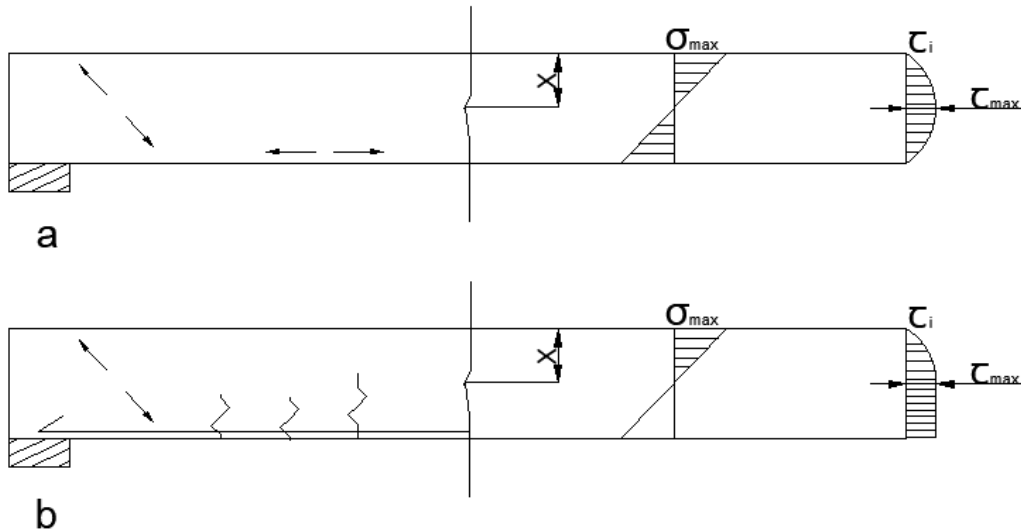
The normal and shear stresses in reinforced concrete section generated due to shear and bending moment a) concrete section is uncracked (state I) b) concrete section is cracked with flexural cracks (State II). Based on Engström (2011).
